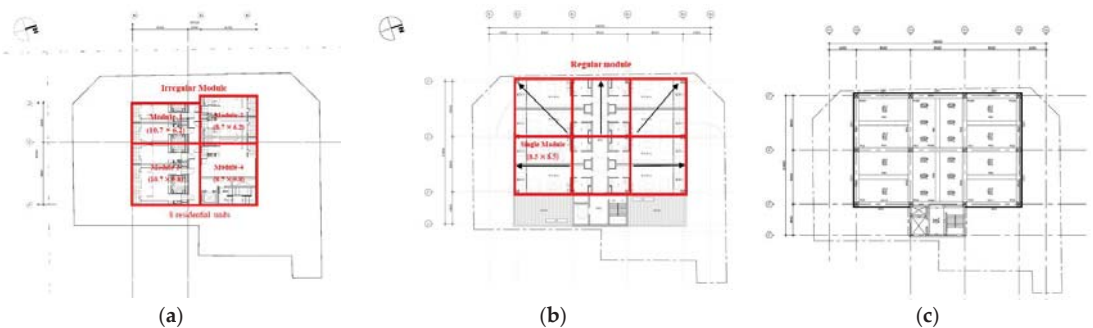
Modification for PC slab standardization: (a) floor plan of public housing before modification; (b) floor plan where regular architectural design module is integrated; and (c) standardized PC slab after modification.
